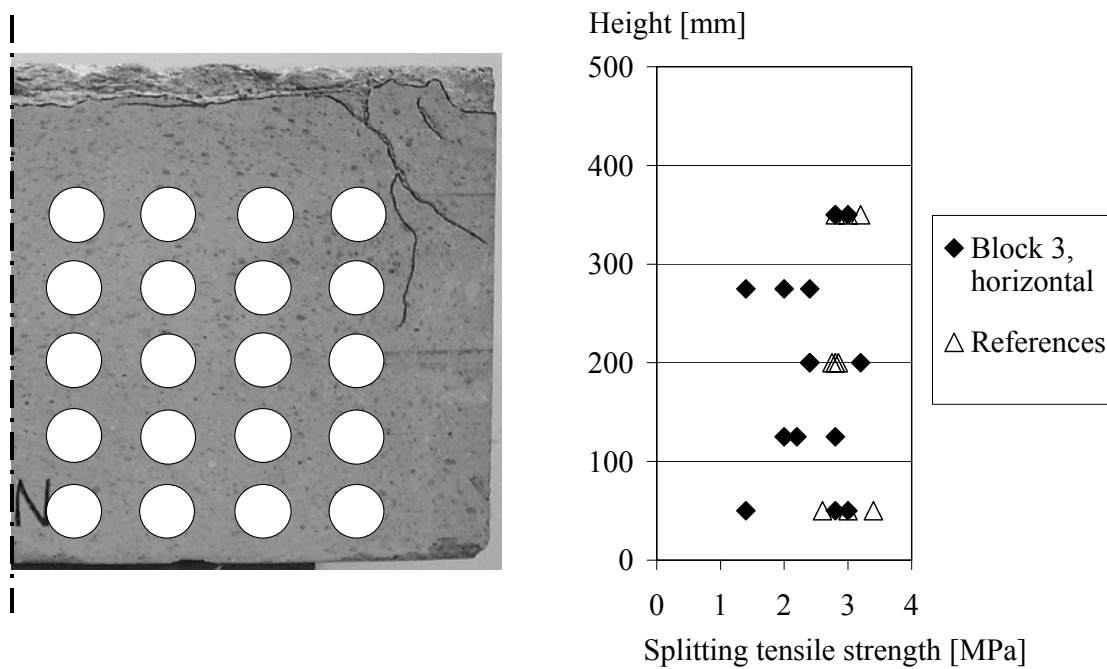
Uniaxial splitting tensile tests, horizontally drilled cylinders, block No. 3.
